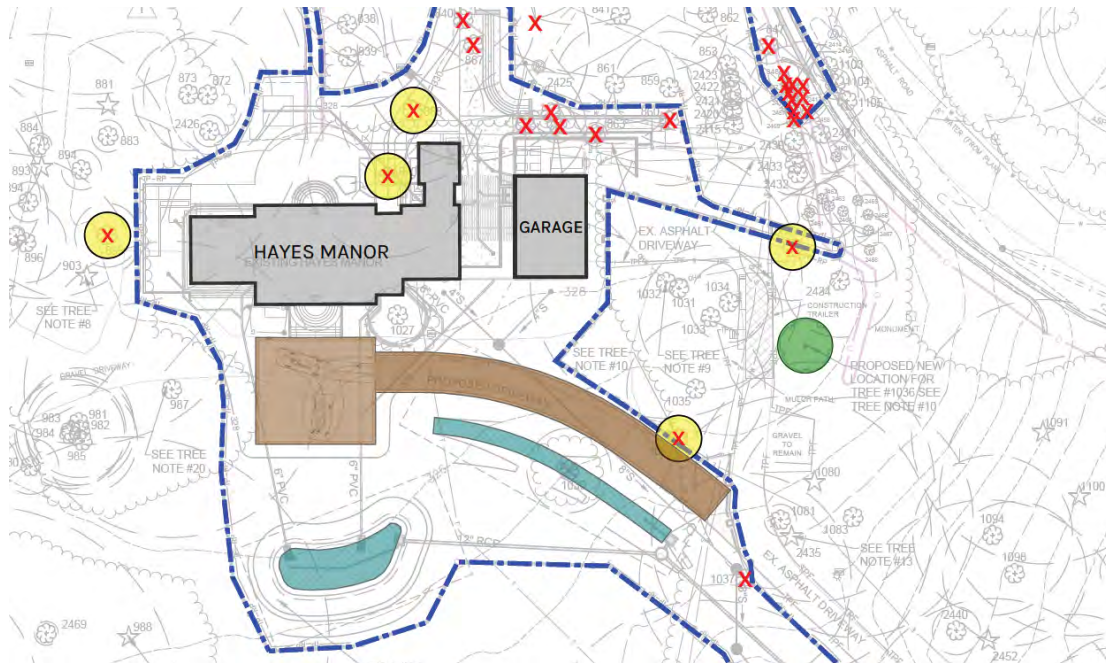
Revised site plan showing the new turnaround and bioretention area.
